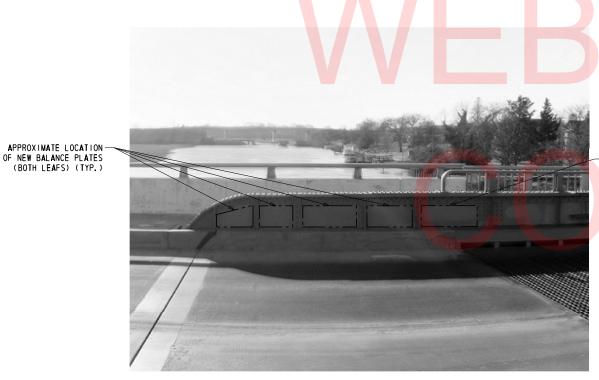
TYPICAL BASCULE GIRDER AT ROADWAY LEVEL
